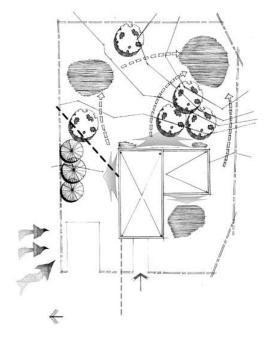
A site plan showing site characteristics (views, drainage, ... etc).
